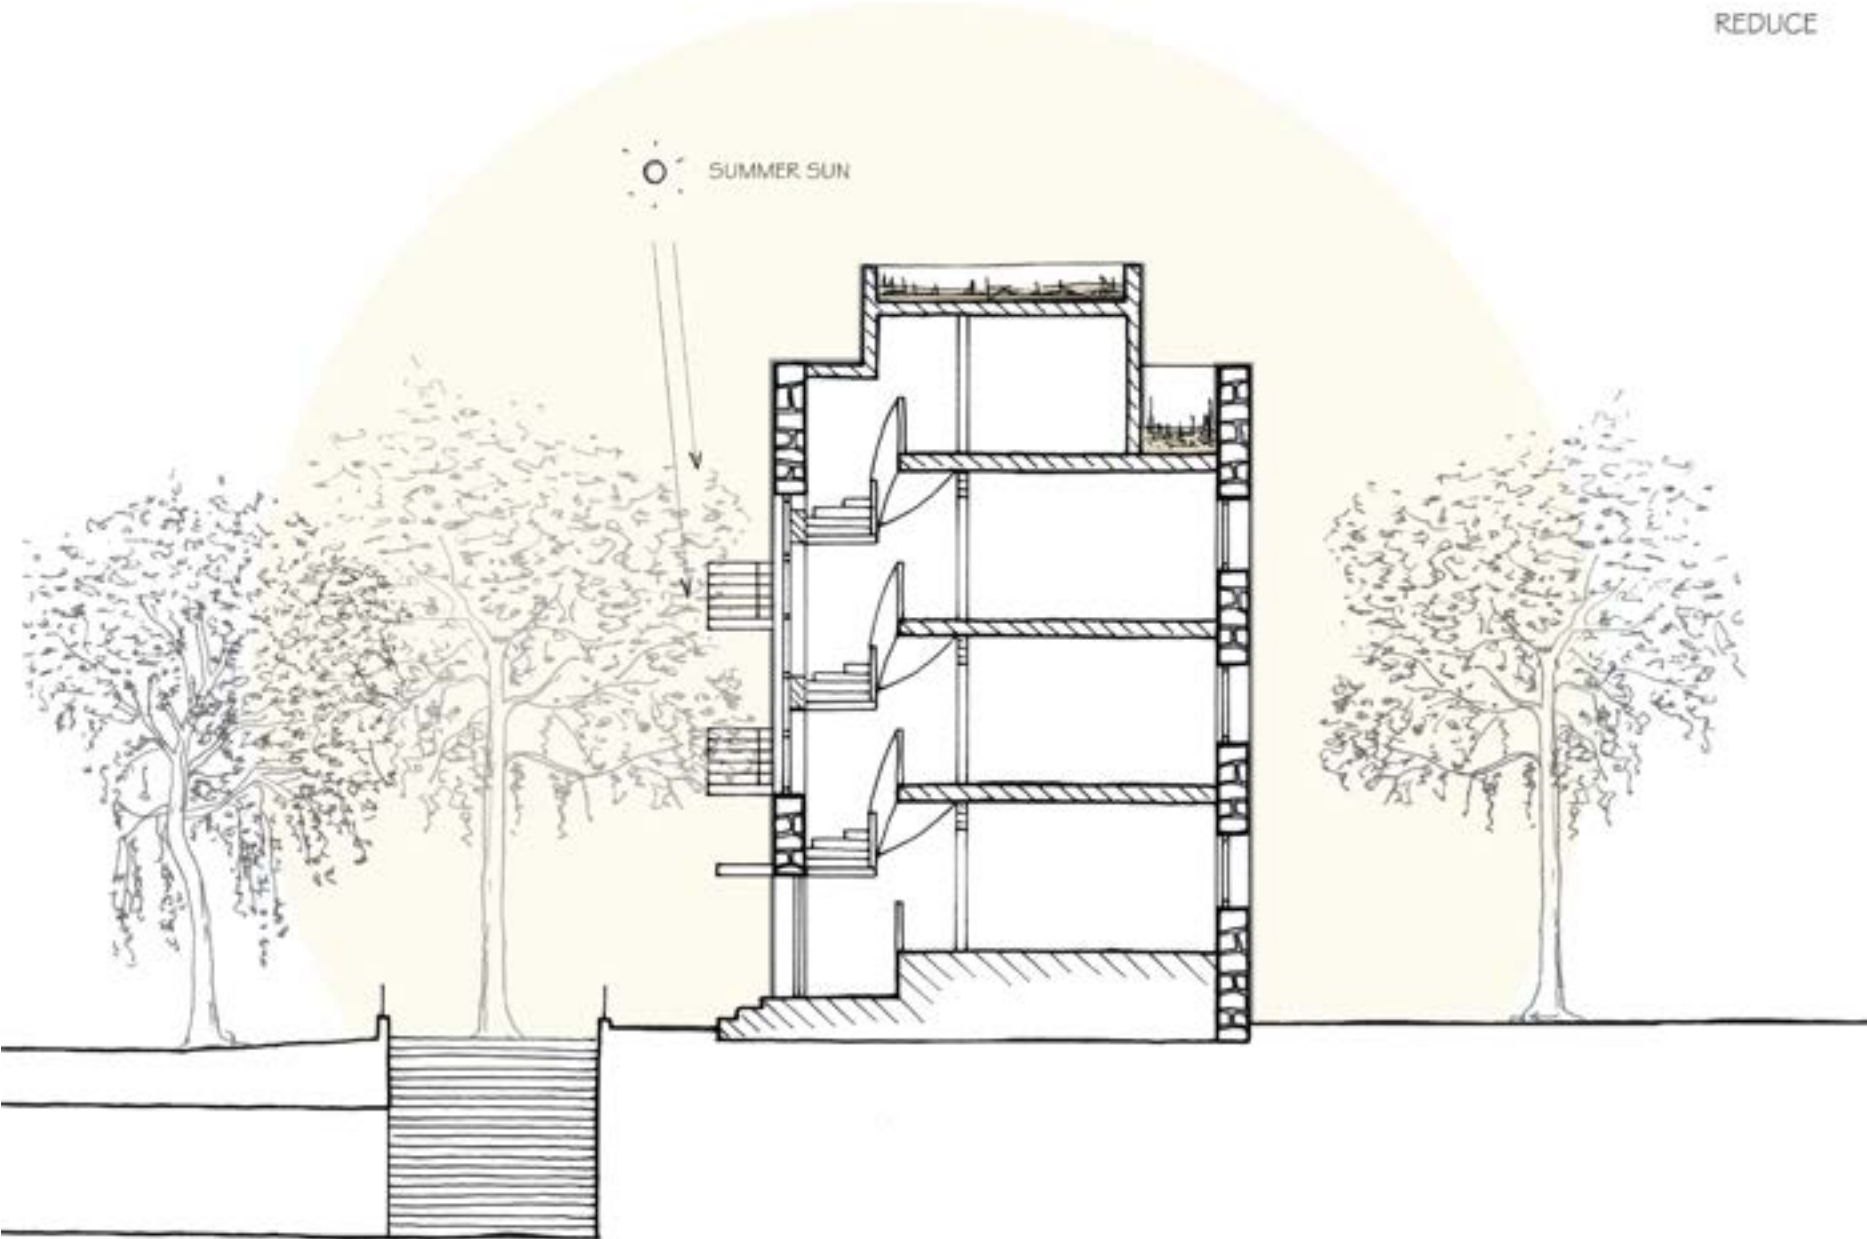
Author (2022). Section of the first building of Prosfygika - Reduce (green facade) [Sketch].
